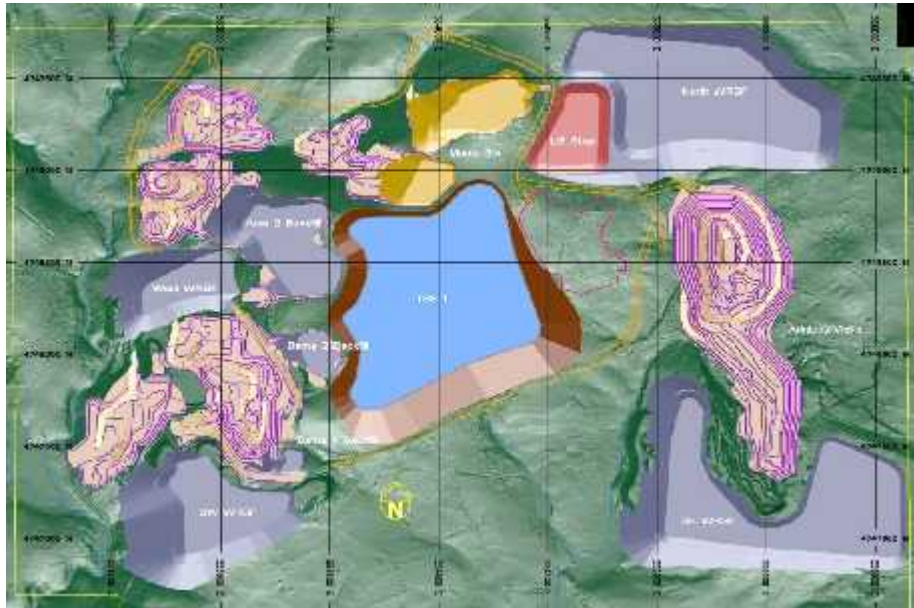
Waste Rock Storage Facility Locations (Rose 2017)
